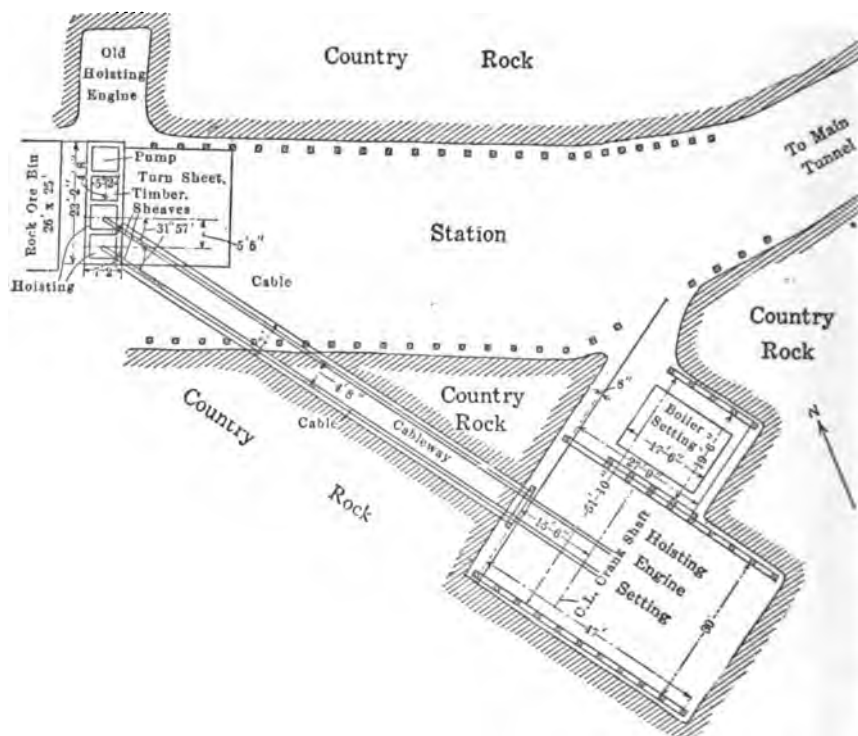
GENERAL PLAN OF TIMBER, BOILER AND HOIST STATIONS, MORNING MINE, MULLAN, IDA.
